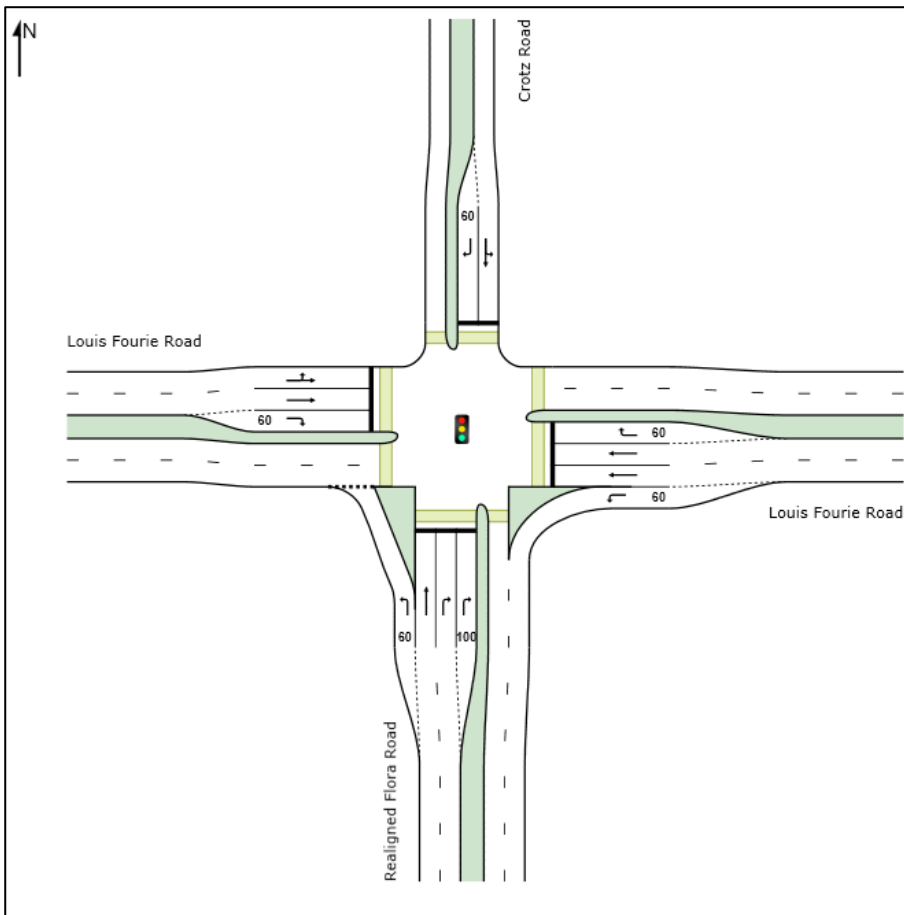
Proposed Intersection Layout: Louis Fourie Road and Crotz Road/ Realigned Flora Road
